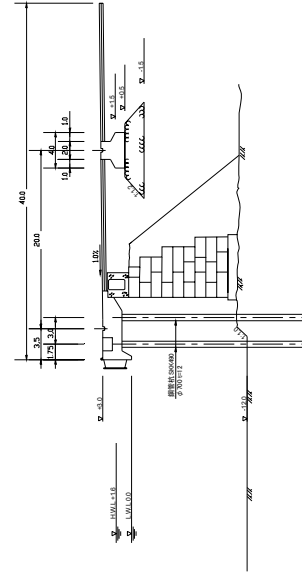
Typical Section of Concrete Caisson Type New Wharf (-13 m)
